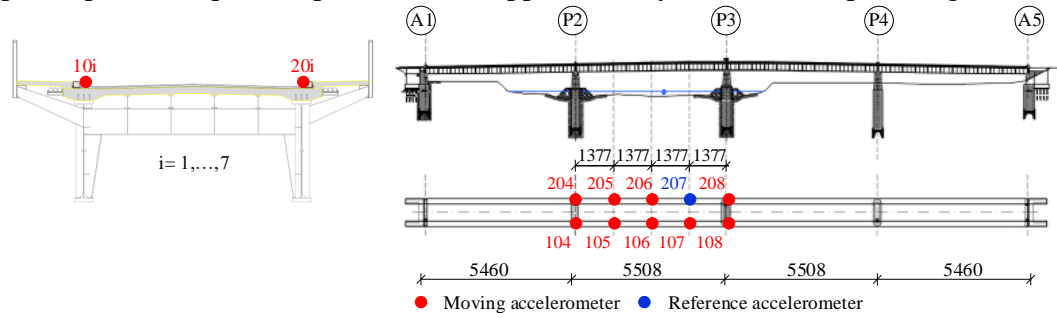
Schematic view of sensor locations: cross-section (left) showing edge positions and longitudinal section (right) with reference and measurement points spaced approx. 13.8 m apart
